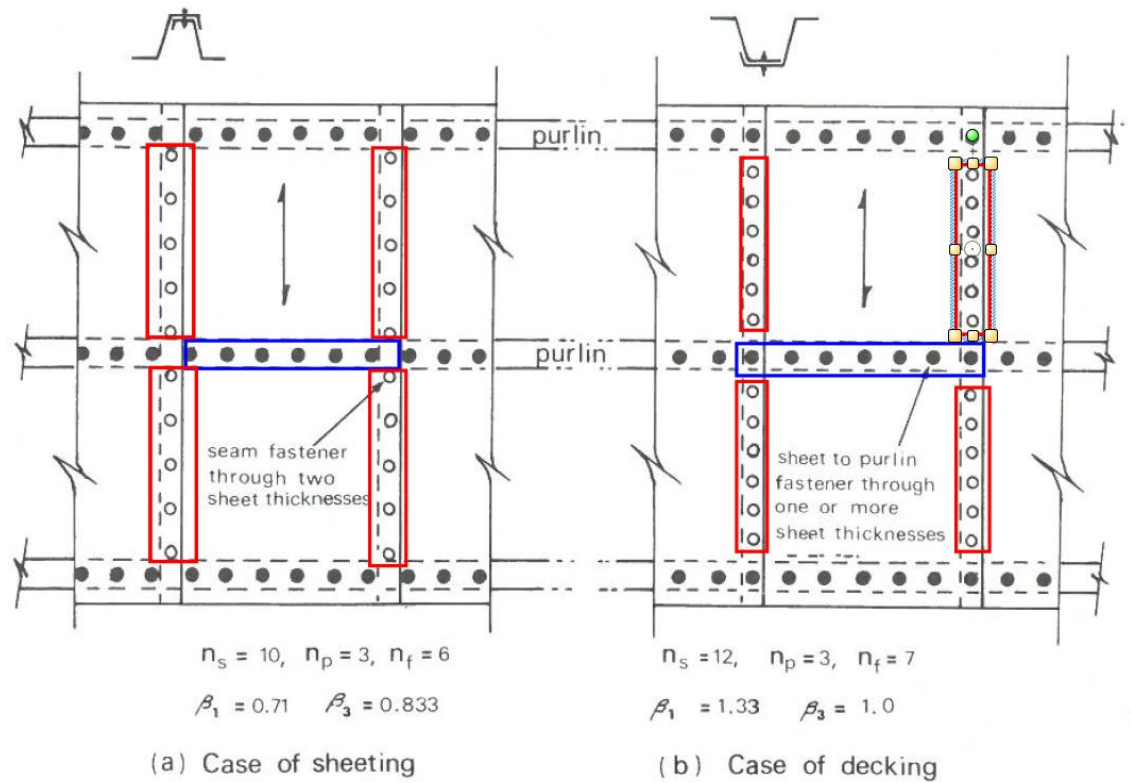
Alternative seam arrangements (a) case of sheeting (b) case of decking
